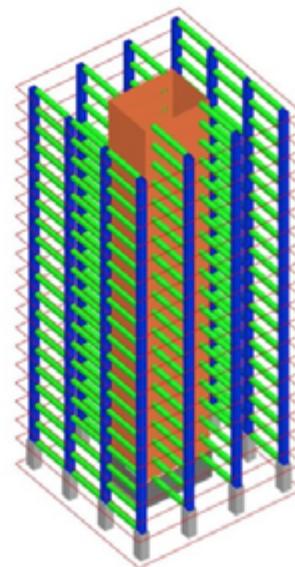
Isometric of proposed timber structural system for twenty storey building with a rectangular core of integrated CLT panels, and engineered timber columns & floor beams
